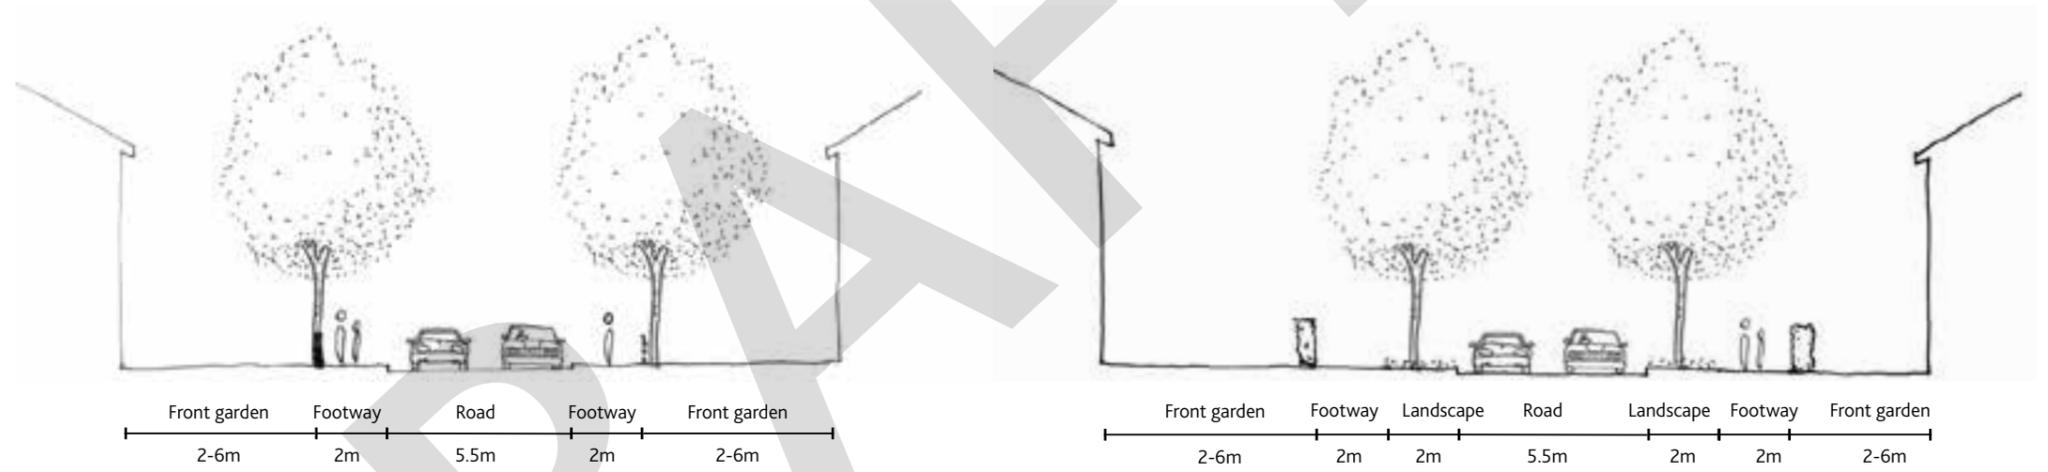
Typical street section 02 - Primary Route without / with landscape strips
